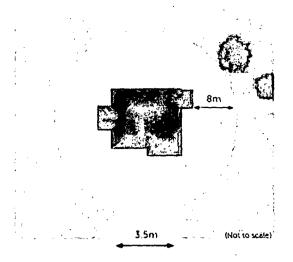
DRIVEWAY SURROUNDING THE BUILDING
